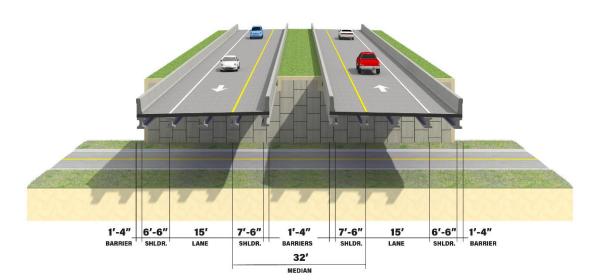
Proposed Bridge Typical Section (2-Lane)
